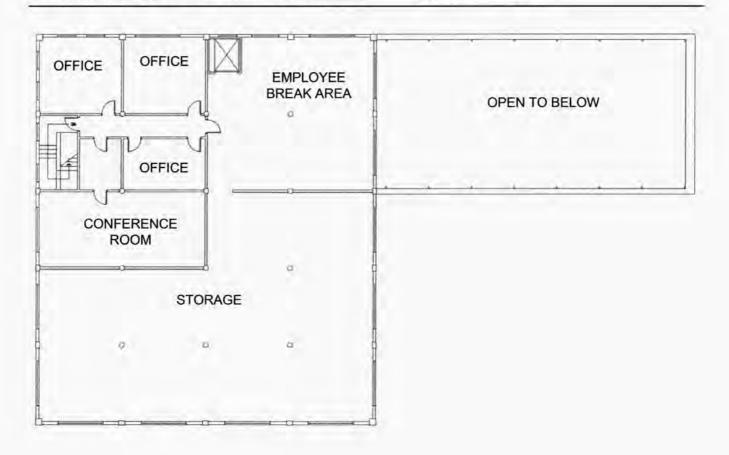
Second Floor Plan - Not to scale. Plan by APMA 2011.
